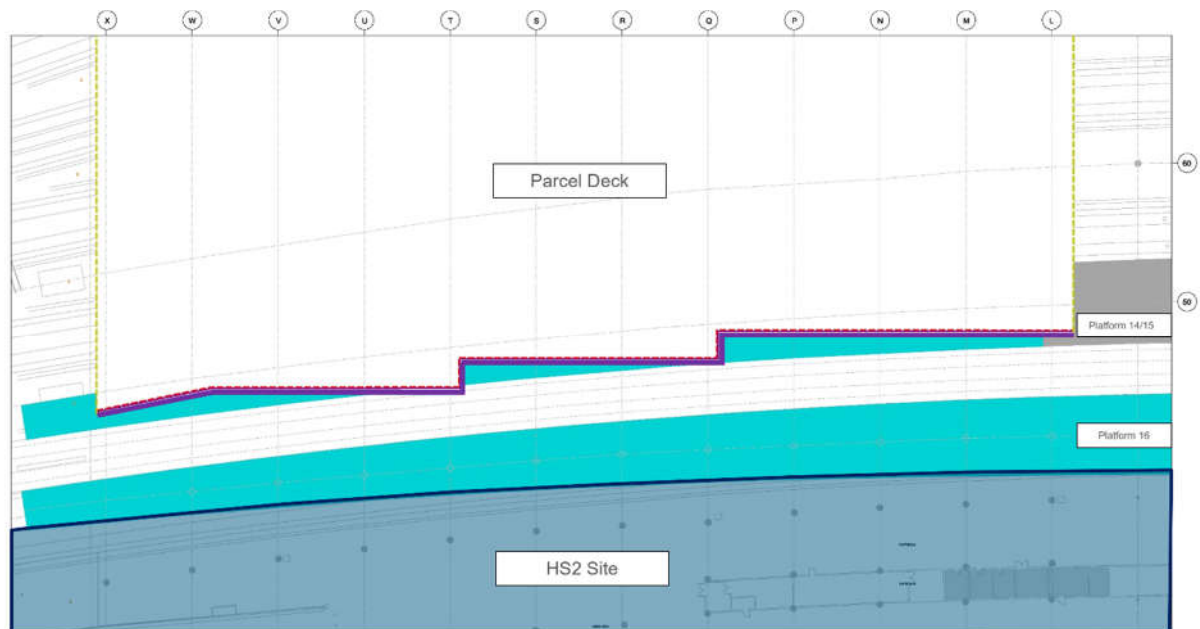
Parcel Deck Façade Cutline – Option 1- structure would be located above tracks and OLE
